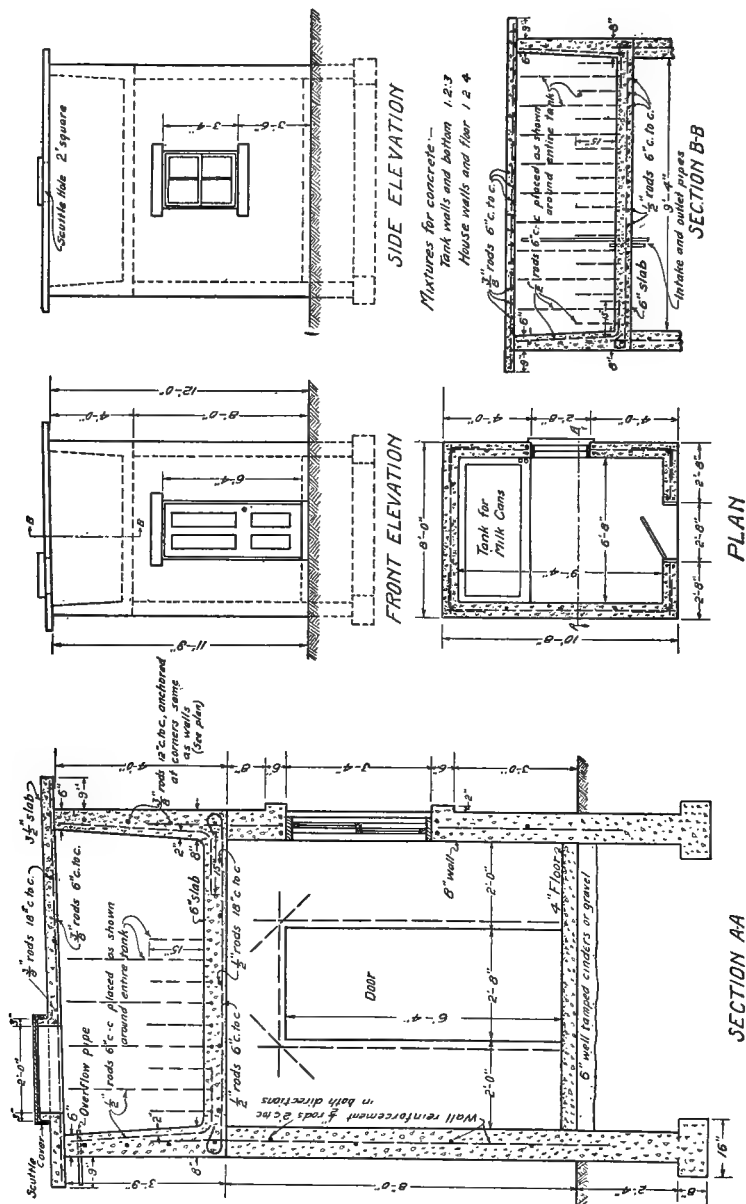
Reinforced Concrete Milk House with Overhead Water Supply Tank.
